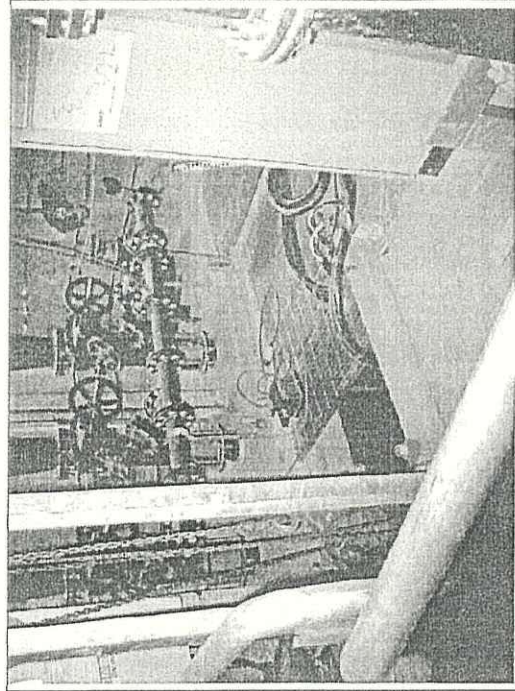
Sump pit and the associated pumping pipes inside Tai Lam Tunnel
